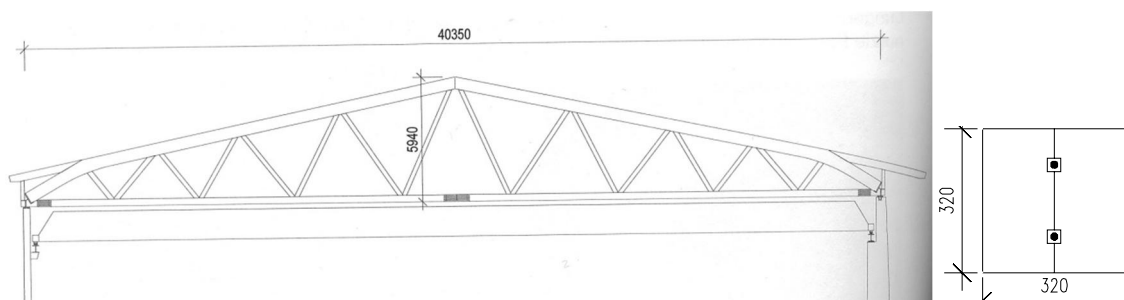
Left: post-tensioned truss [108]; Right: cross section of the prestressed tension member
